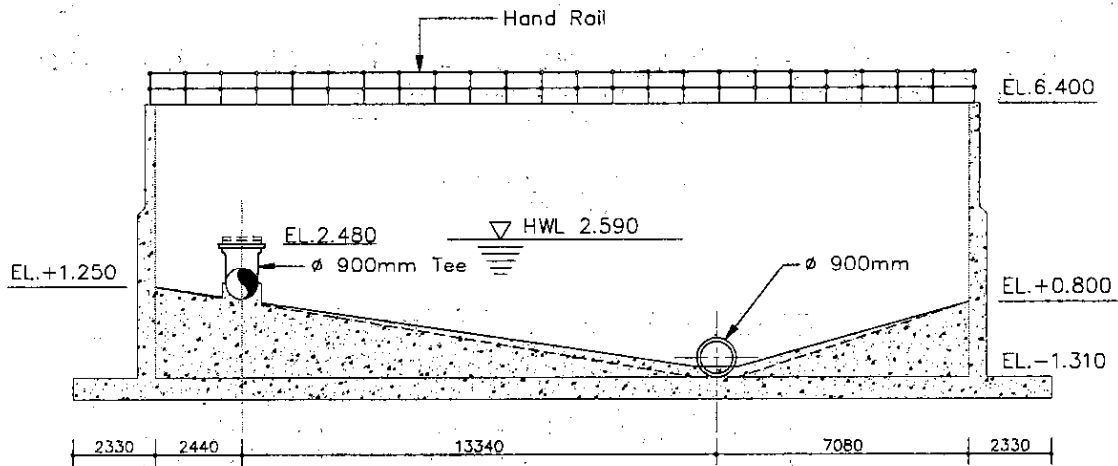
LAYOUT PLAN & SECTION OF TRANSMISSION PUMP HOUSE
